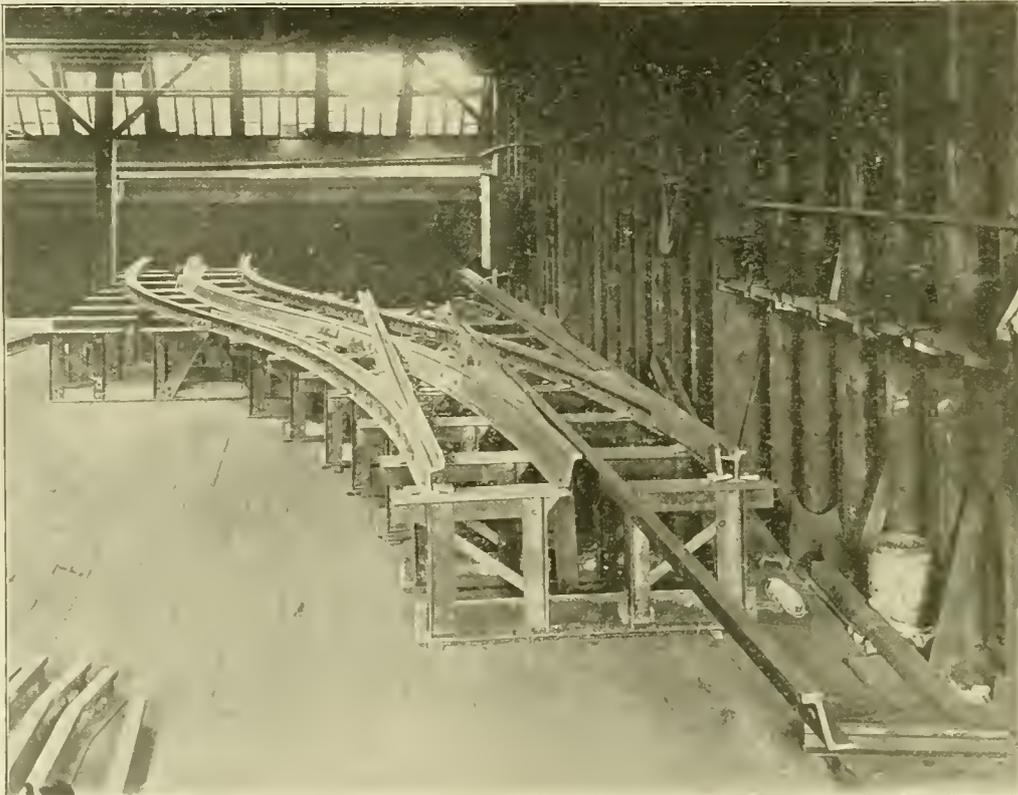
SWITCHES AT SEVENTY-FIRST STREET AND COTTAGE GROVE AVENUE, CHICAGO.
